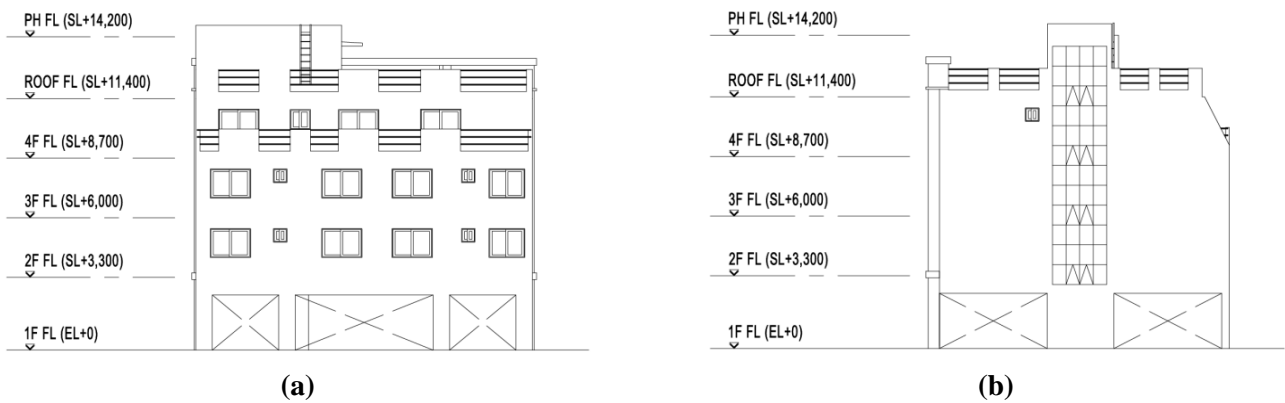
Piloti-type structural elevation. (a) Front view; (b) side view.
